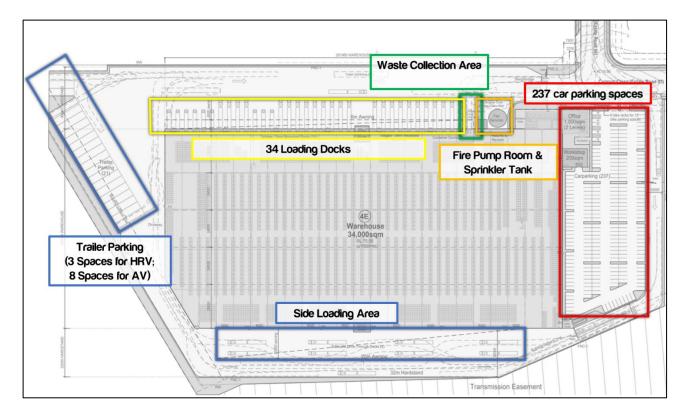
Light and Heavy Vehicle Parking and Loading Areas
